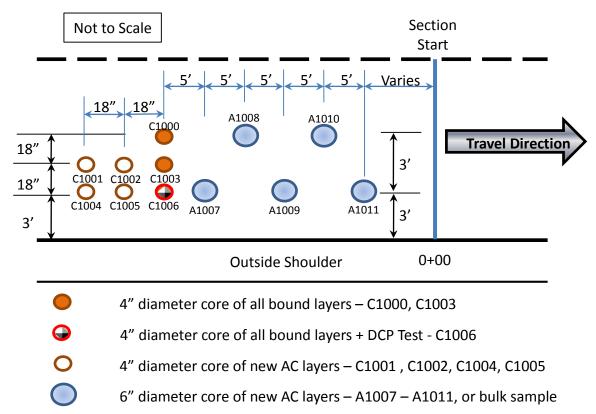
Standard sampling plan locations at approach end of test section for new AC overlays.
